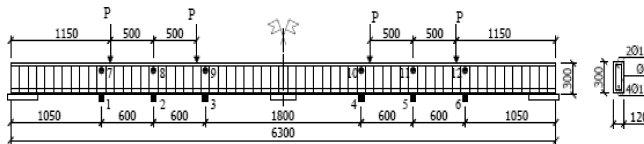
Diagram of the bending test and the scheme of reinforcement structure for a double-span beam with AE sensor spacing
